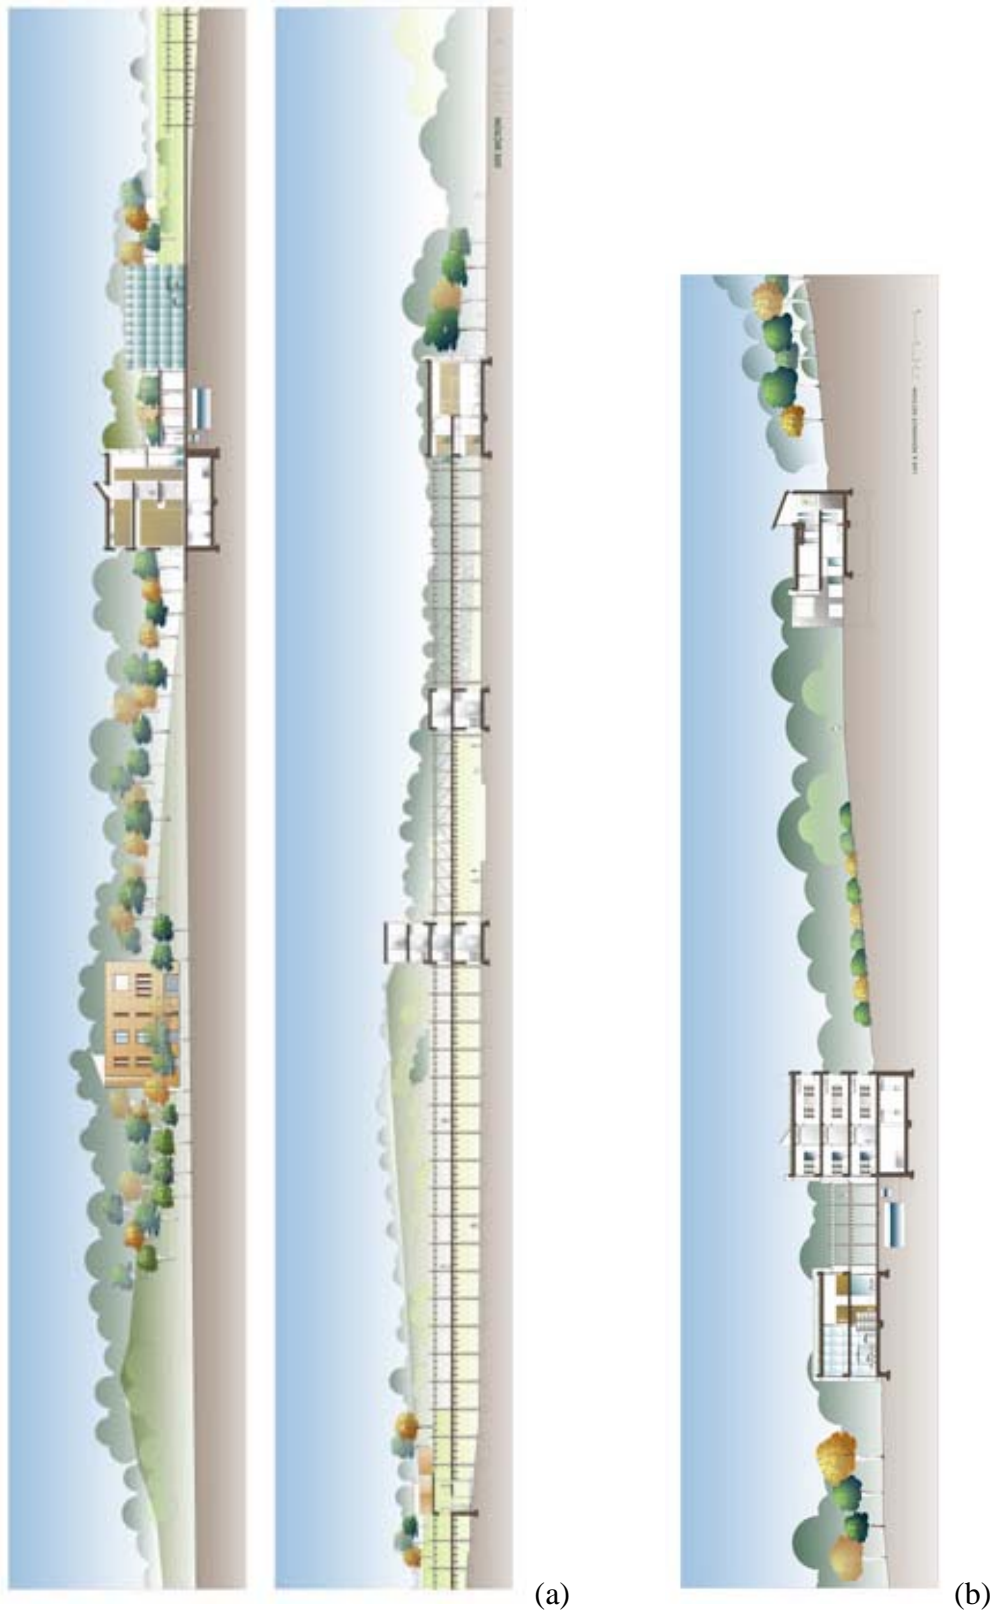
(a) Site Section and (b) section of the laboratory building and the residence
